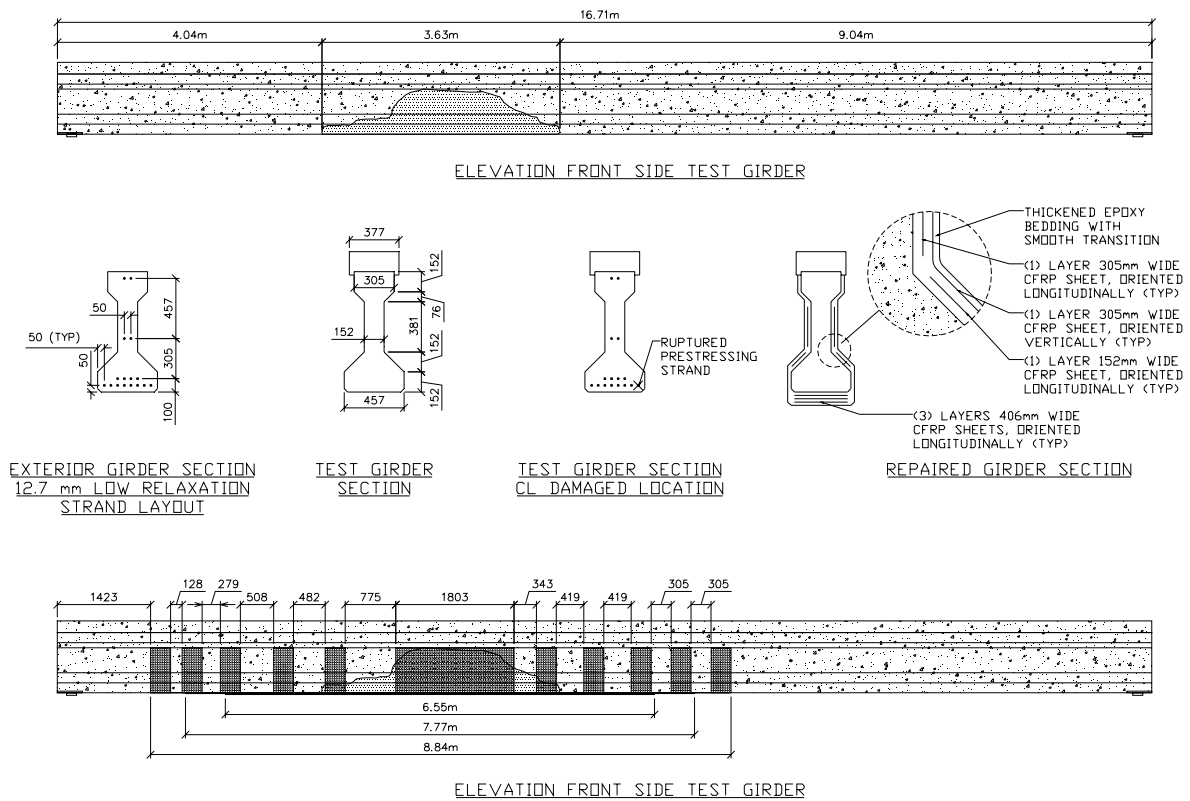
AASHTO1 girder cross section, elevation, and CFRP design details.
